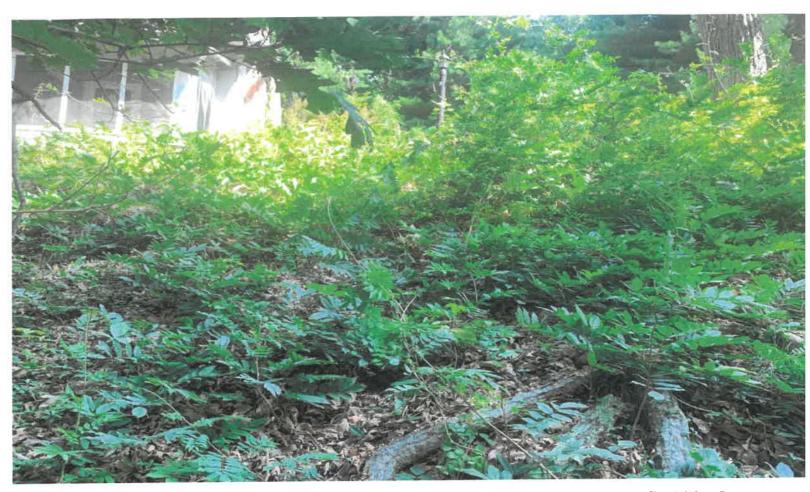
Looking North Up Existing Slope. No Erosion Present, Area Stabilized
